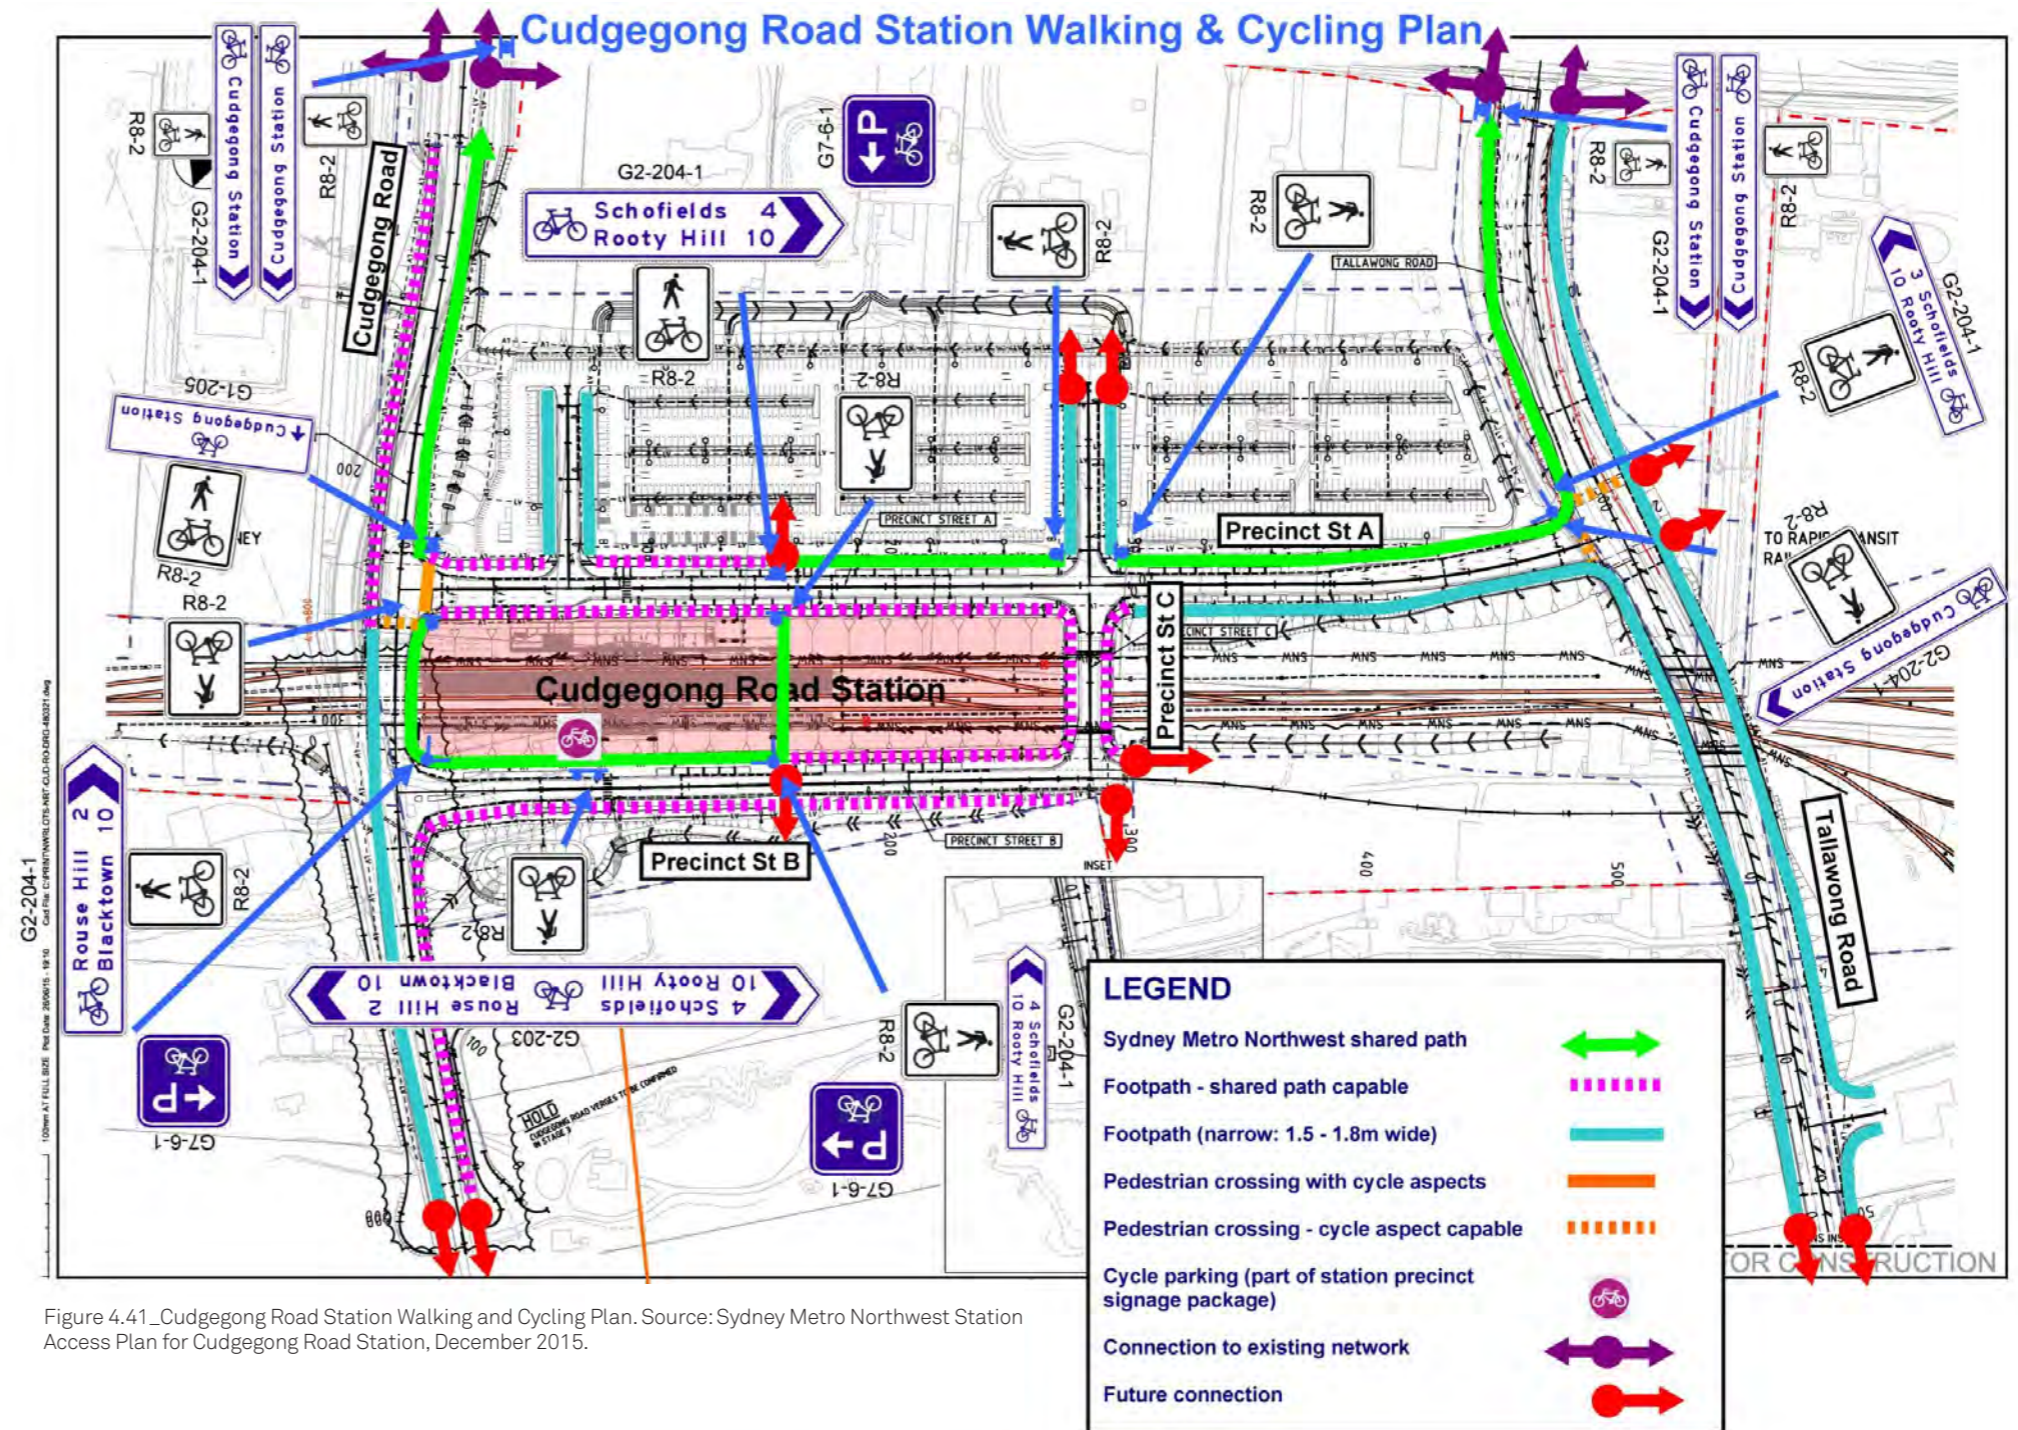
Cudgegong Road Station Walking and Cycling Plan. Source: Sydney Metro Northwest Station Access Plan for Cudgegong Road Station, December 2015.
